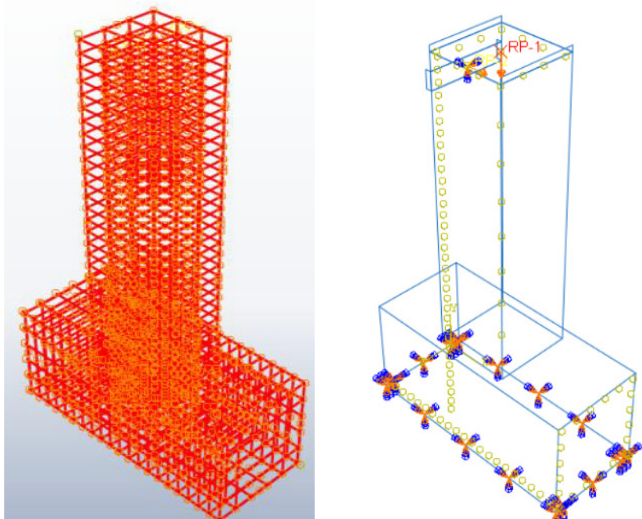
Generated geometric model for the simulation of the RC column: a) Steel reinforcement details, b) Loading and BC application.
